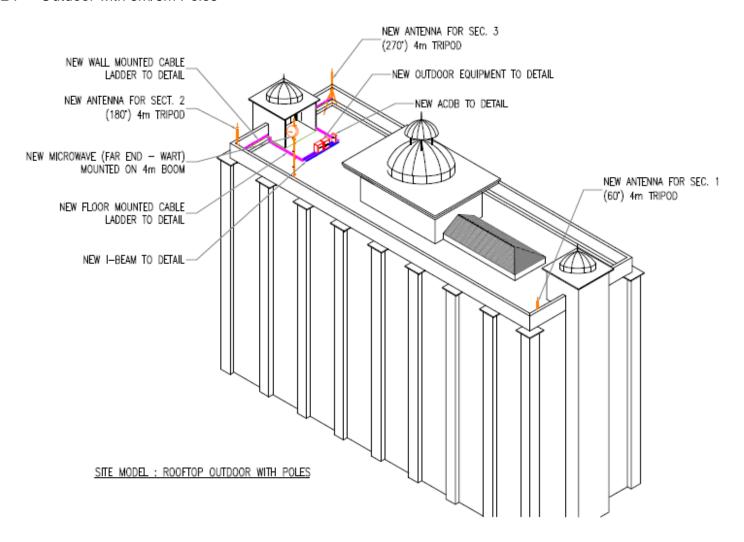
Examples of RoofTop Outdoor with 3m/6m Poles
